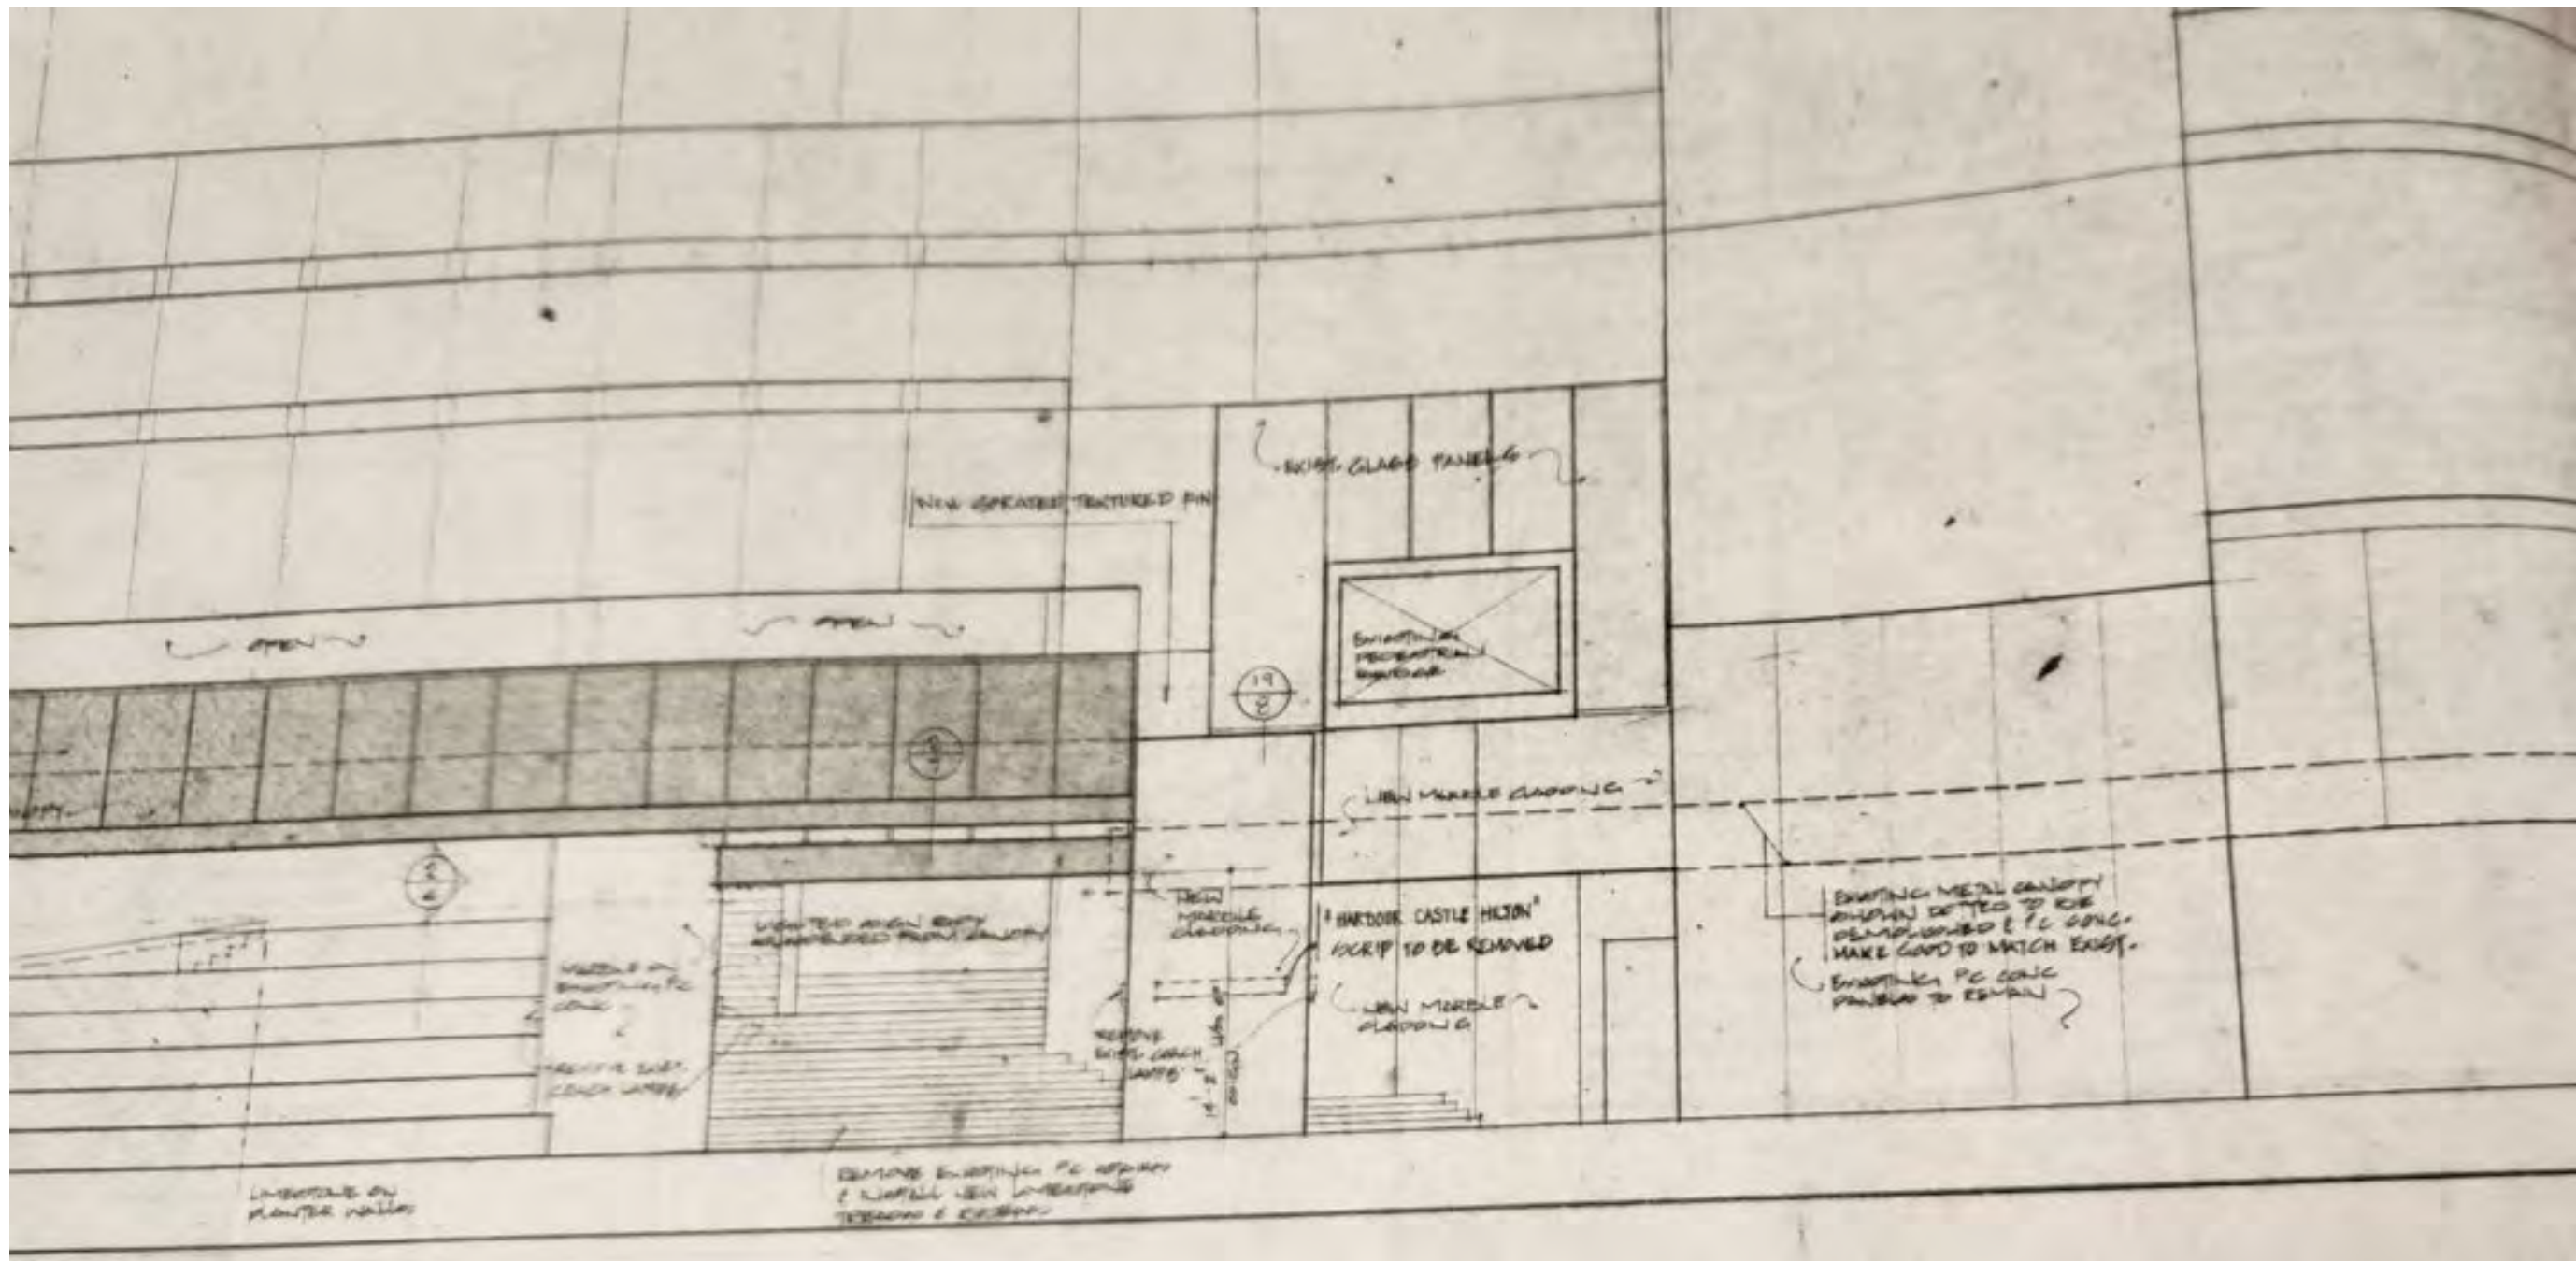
Detail of drawing showing proposed changes to hotel entrance on north elevation, west half, c. 1982 (Webb Zerafa Menkes Housden Partnership Architects).
